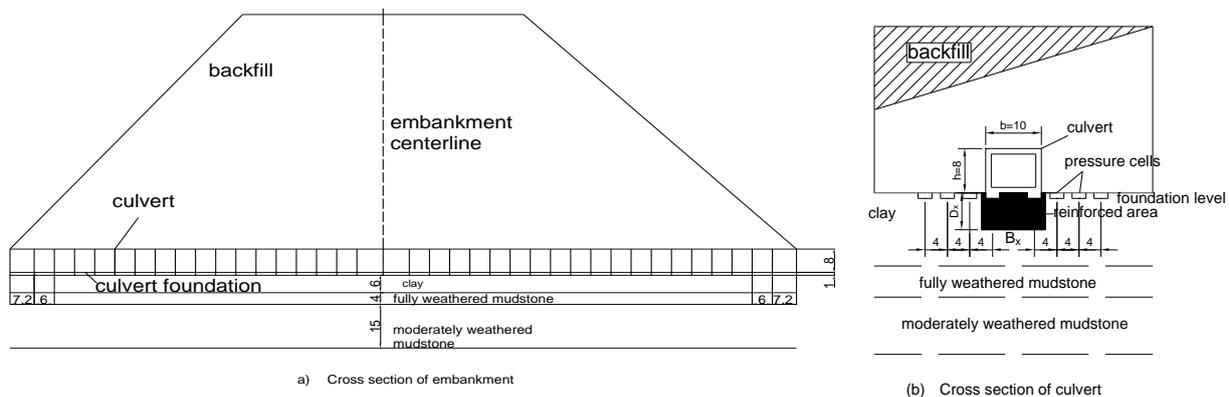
Field layout of the culvert, cross-sections of embankment and culvert
